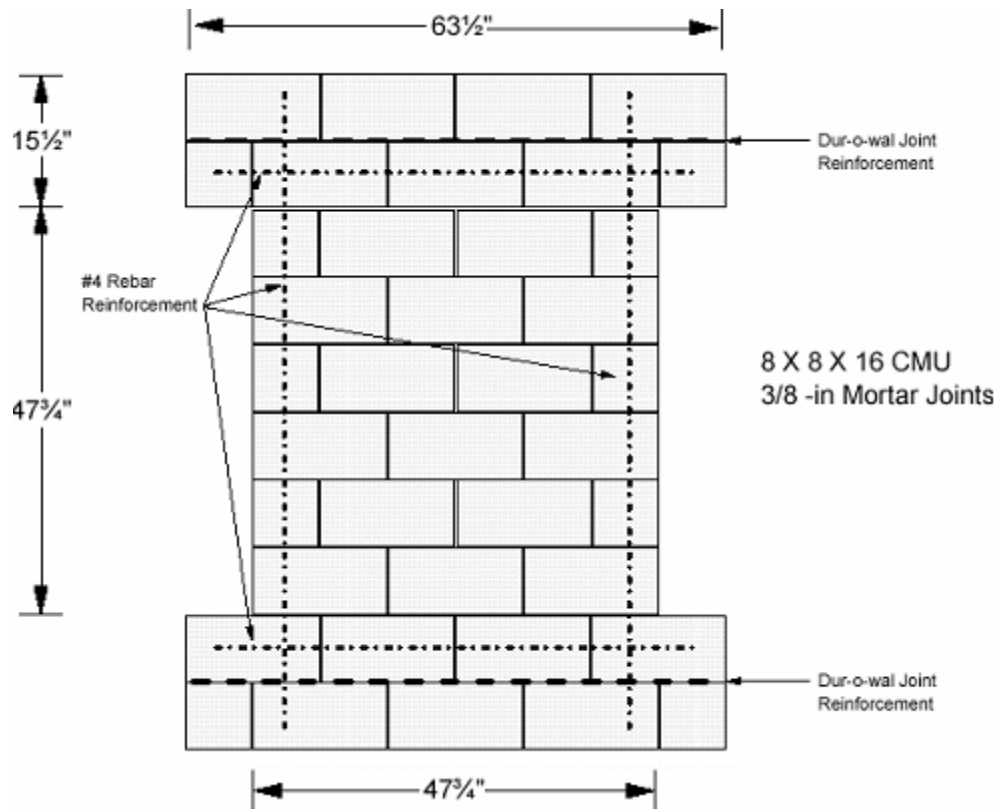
Schematic of in-plane test specimen showing the location of reinforcement.(taken from Marshall, 2002).
